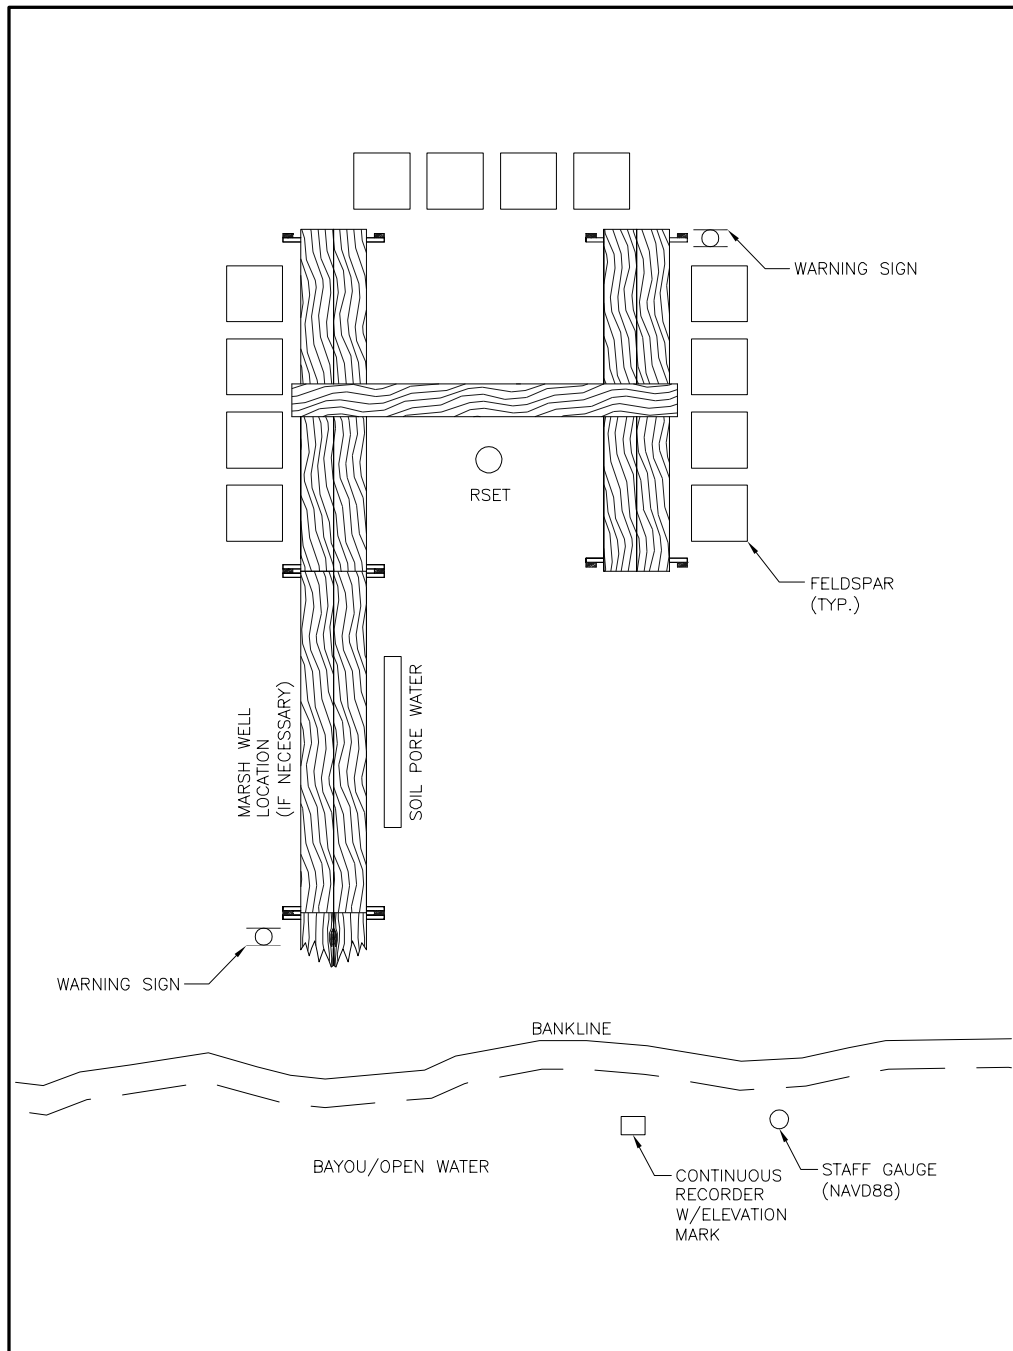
Typical layout schematic of the constructed site features at an attached marsh site.
